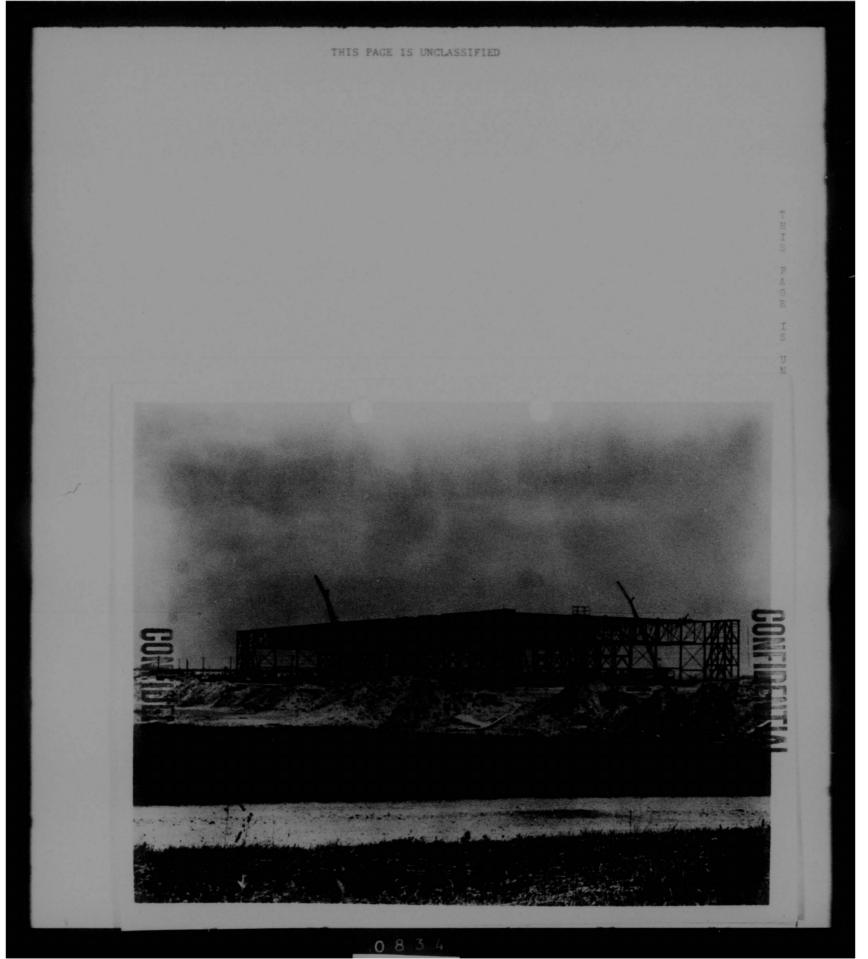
PHOTO OF THE NEW WING HEADQUARTERS BUILDING BEING CONSTRUCTED AT MCGUIRE AIR FORCE BASE. PHOTO TAKEN ON 17 MAY 1954.
